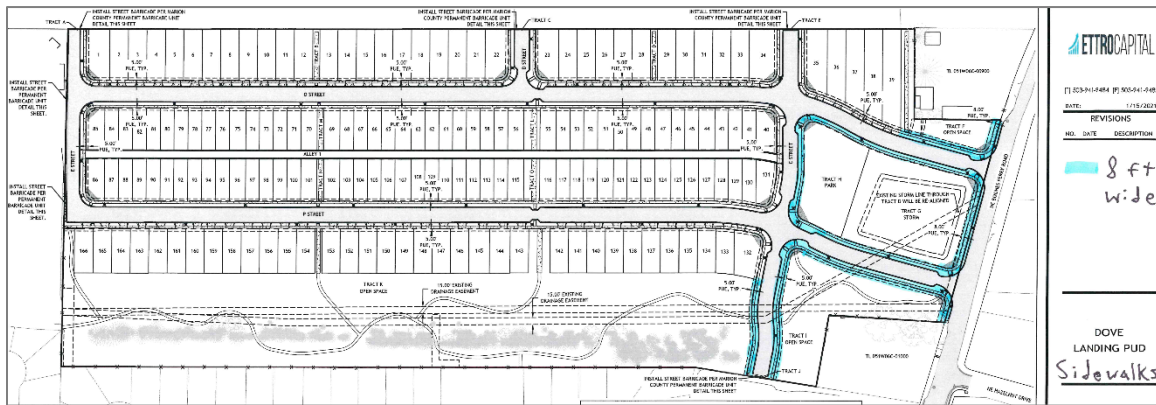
Sidewalks (blue: min 8 ft wide)
